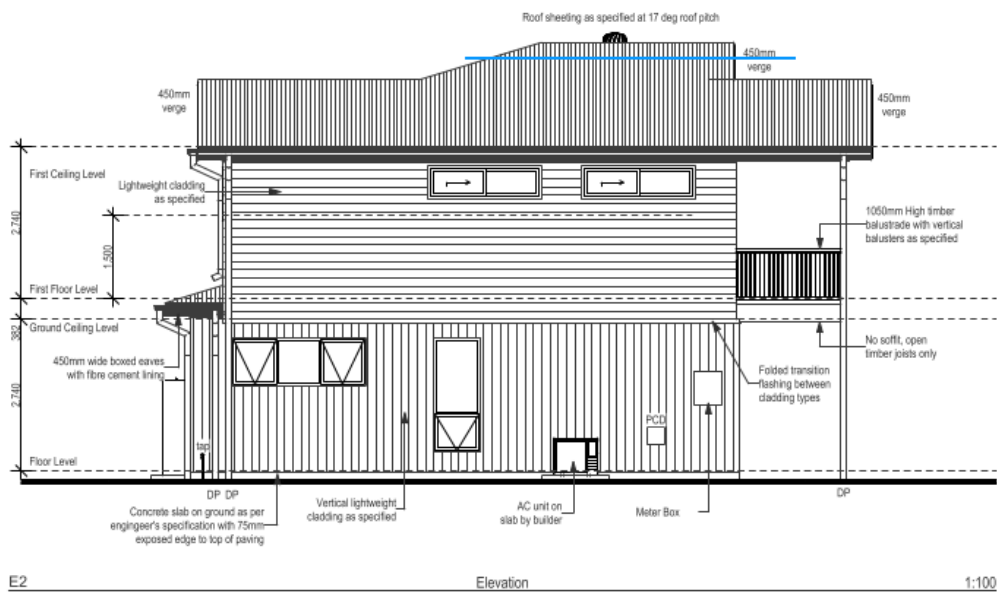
Elevation Plan- blue line depicts approximate location of the section of building over 7.5 metres
